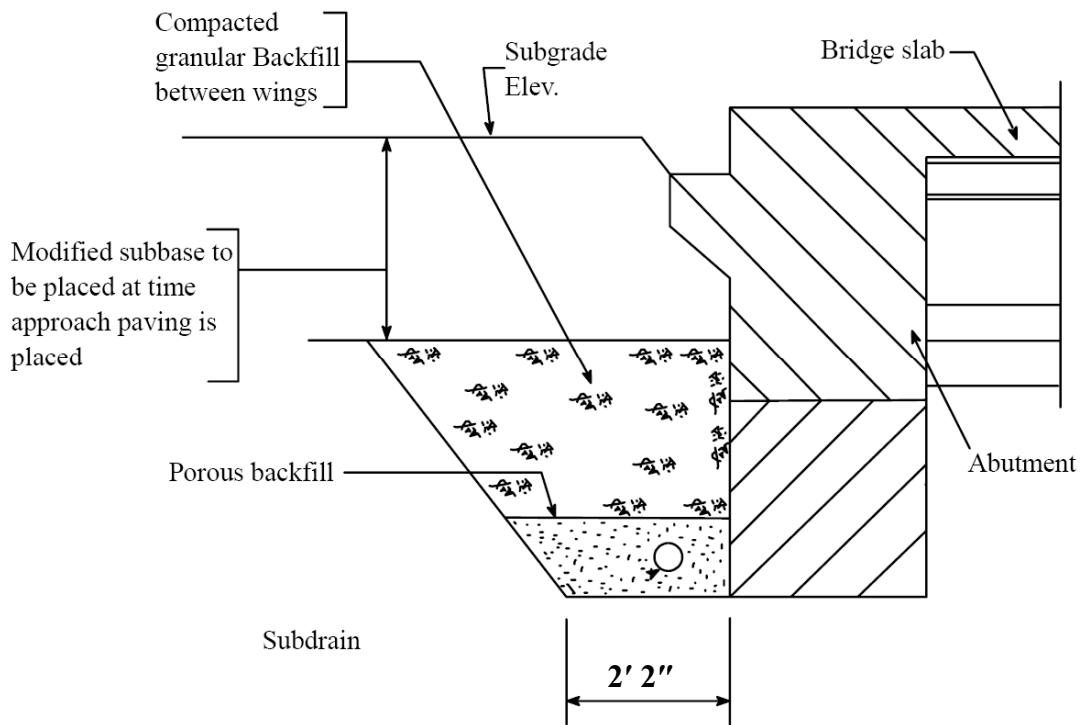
Schematic of Porous Fill Surrounding Subdrain (White et al., 2005)
